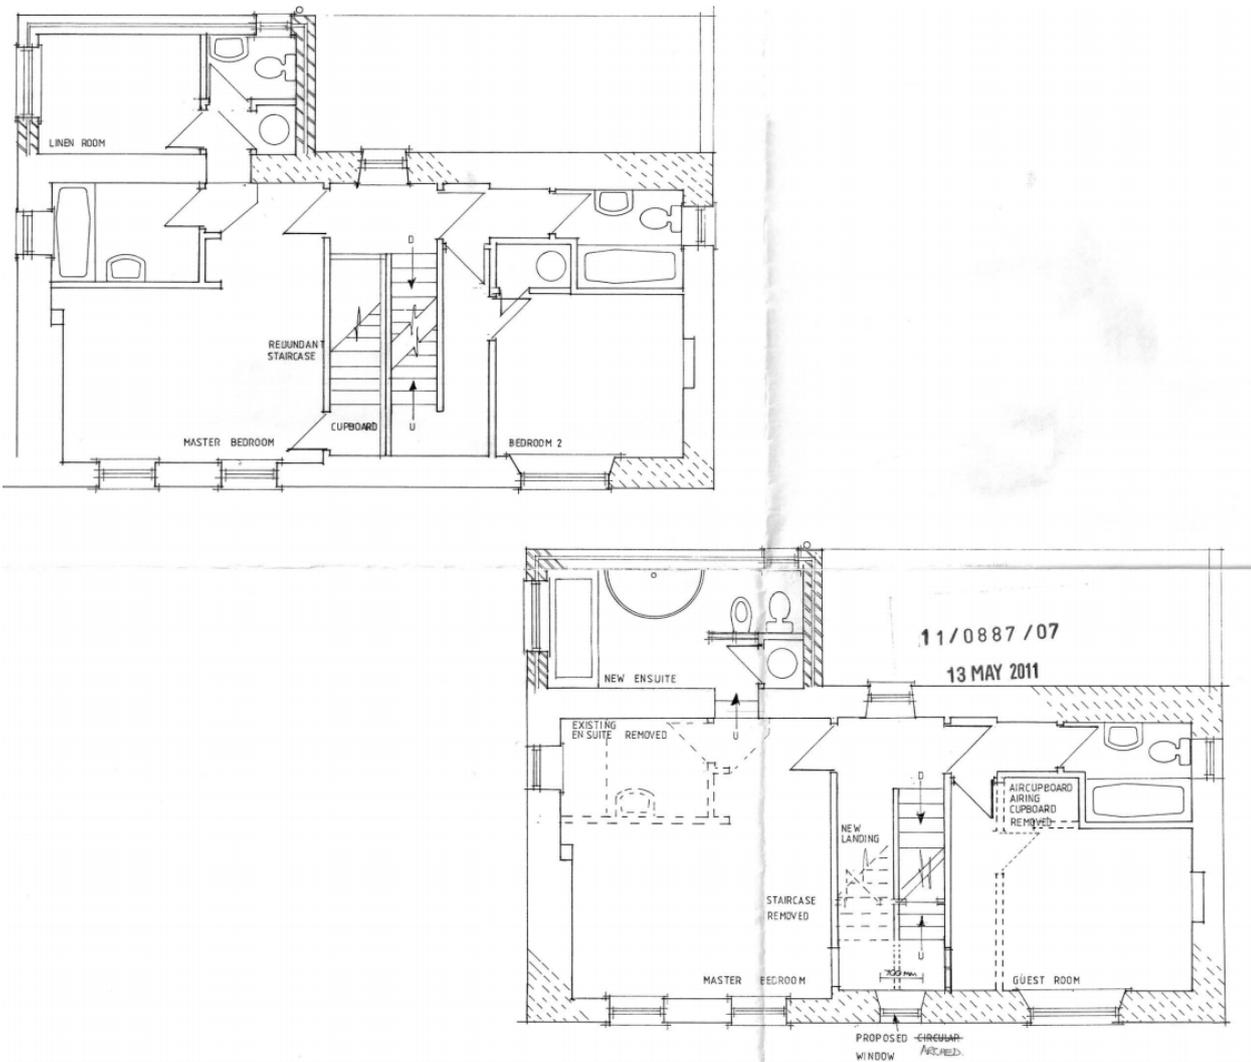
Floor Plans 2011 - Application Existing Above Proposed Below App No 11/0887/07
